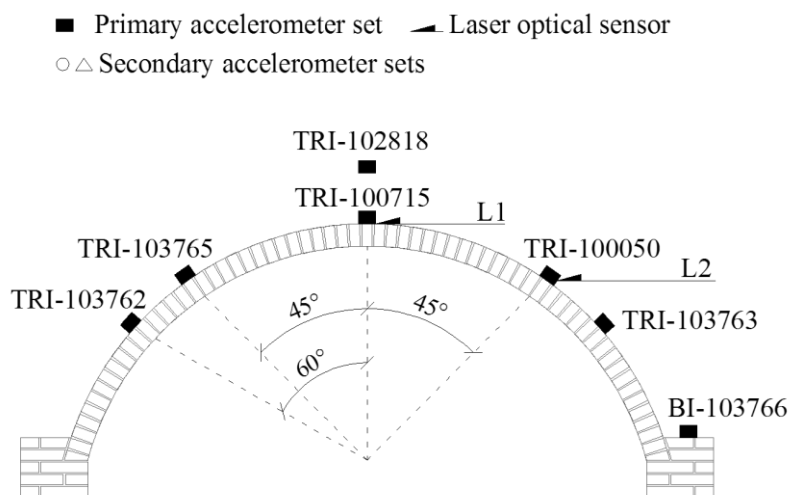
Instrumentation layout: front view (dimensions in cm)
